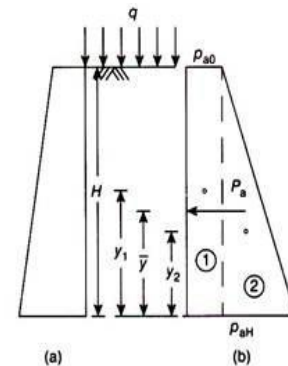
Active earth pressure for a cohesionless backfill subjected to surcharge: (a) Retaining wall and (b) active earth pressure diagram.
